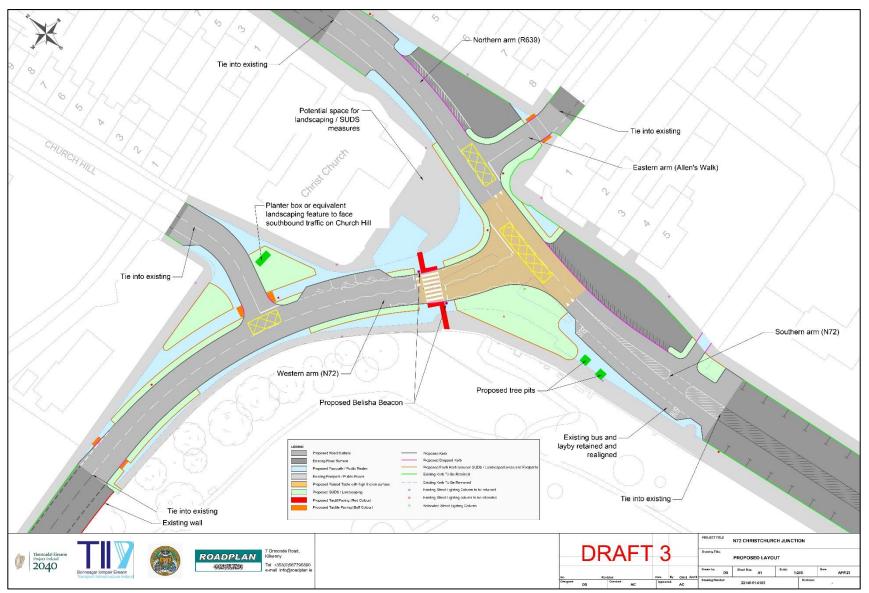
Proposed Layout Plan (RoadPlan Consulting, Drawing No: 22148-01-0103)
